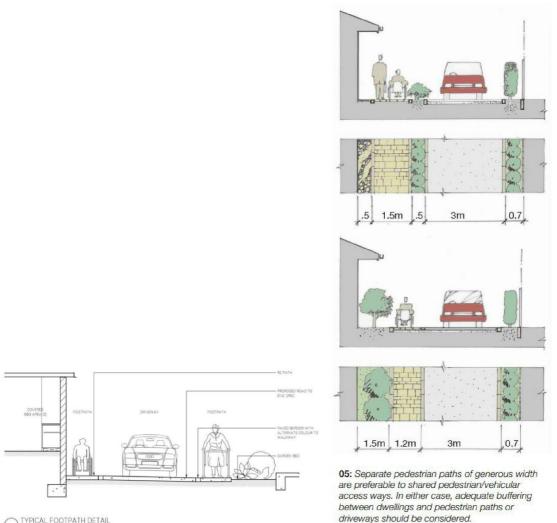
, 9 & 10 - (Left) Detailed Sectional View of the Driveway Detail, (Right) an recommended driveway section as proposed in the "Seniors Living Policy Urban Design Guidelines for Infill Development"
